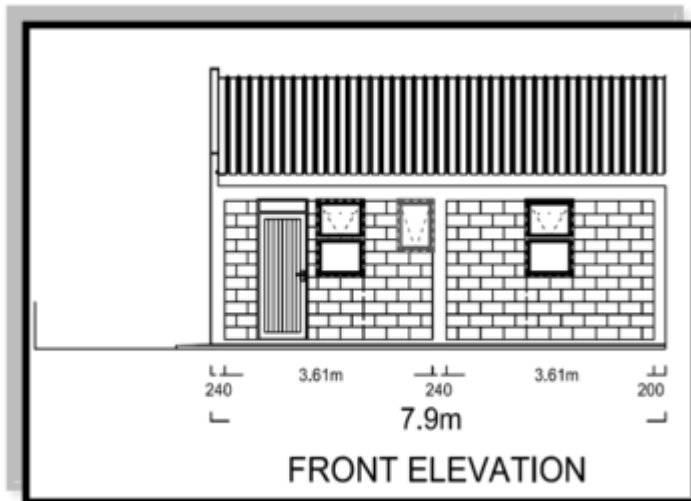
TYPOLOGY A - FRONT ELEVATION
